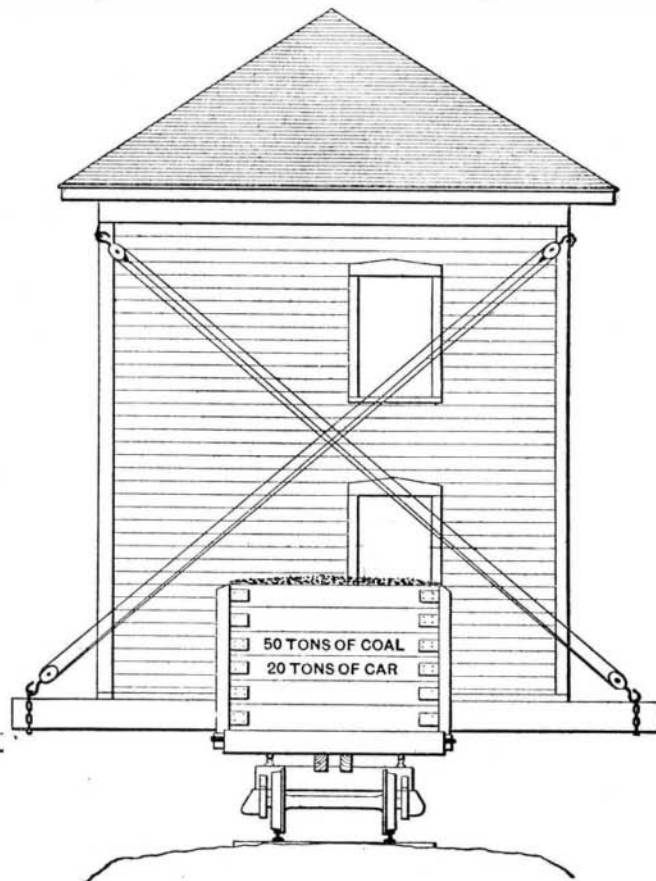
Building Loaded on Cars and Anchored to Coal Cars.—Scale, $\frac{1}{8}$ In. to the Foot.
